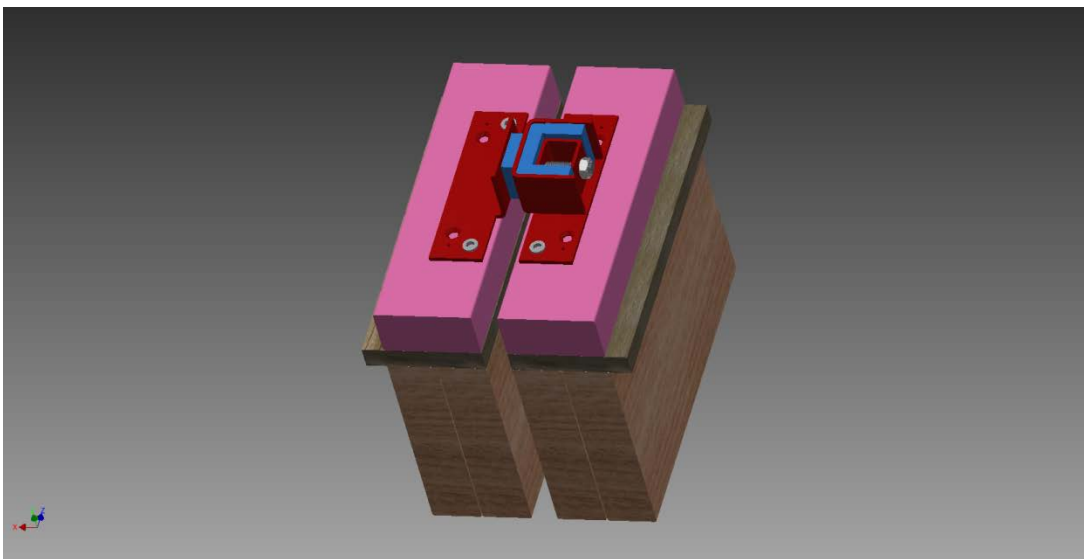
Perspective drawing of the across-plate connector showing installation on to bottom plate and screwed into edge joists.
